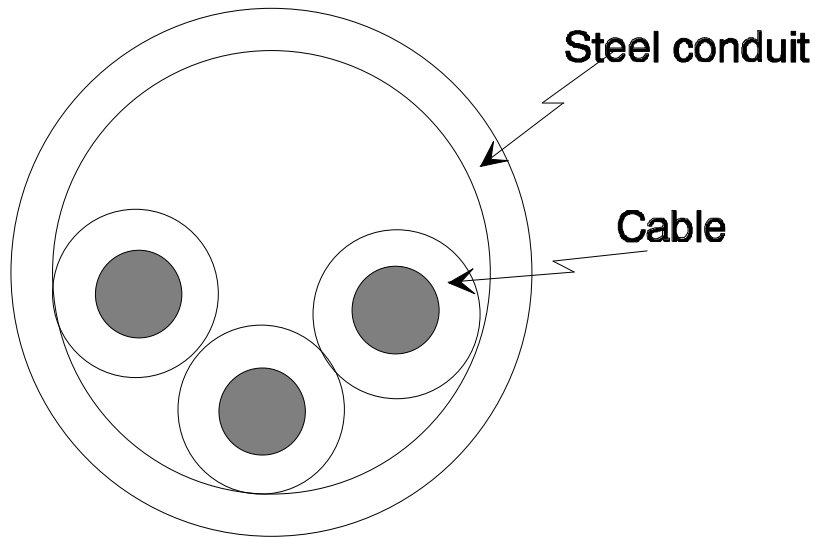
Cross Section of a Steel Conduit Enclosed Distribution System
